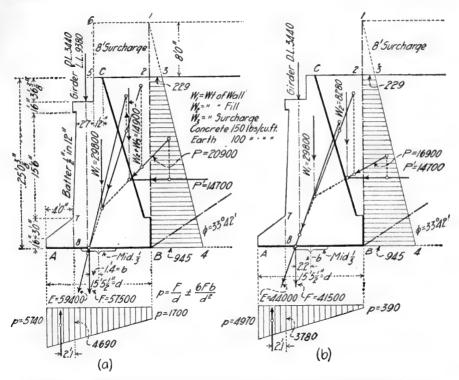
ABUTMENT FOR WEST ALAMEDA AVENUE SUBWAY, DENVER, COLO.
